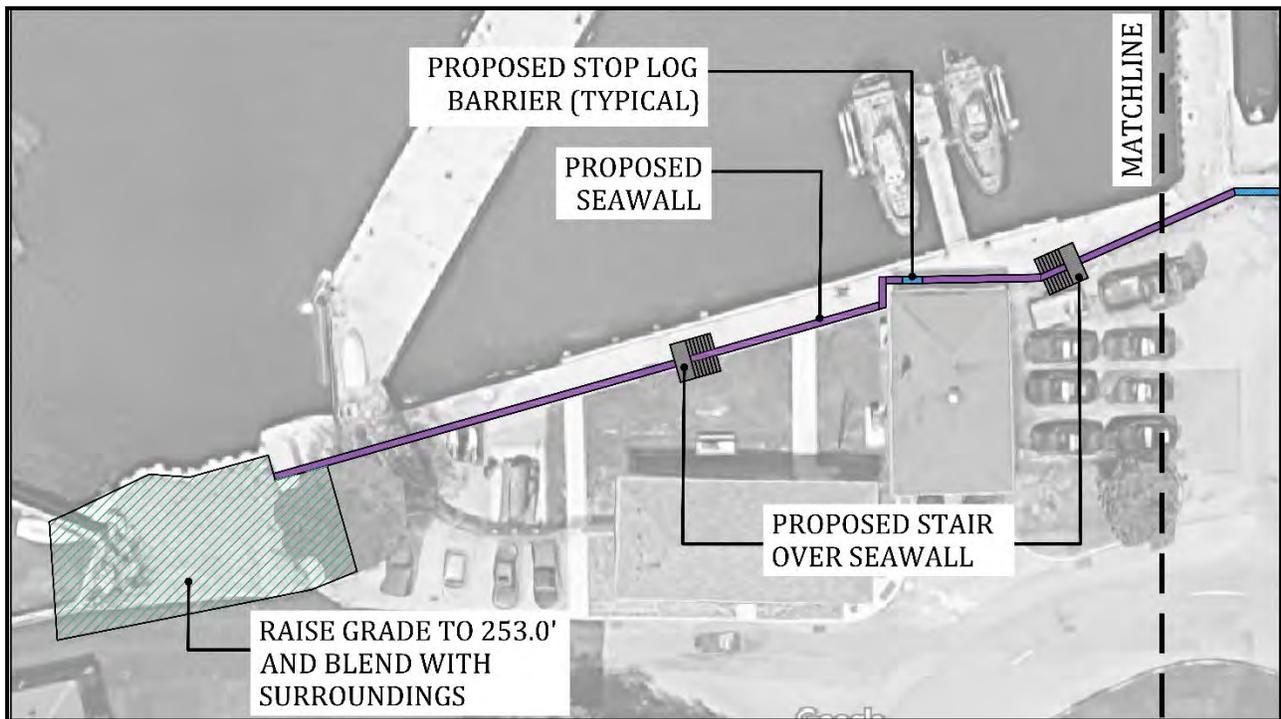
Seawall Concept Plan A: Monroe County Sheriff's HQ
